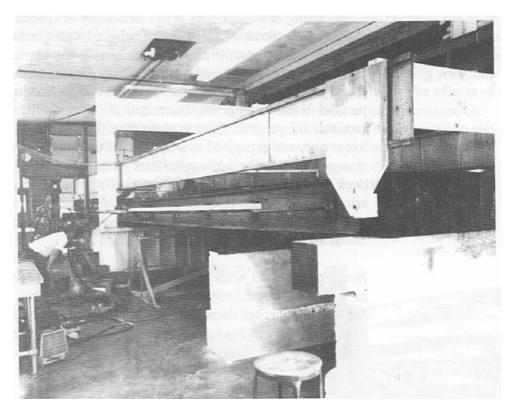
Full-scale experimental stress-laminated deck in the structures laboratory at the University of Wisconsin.
